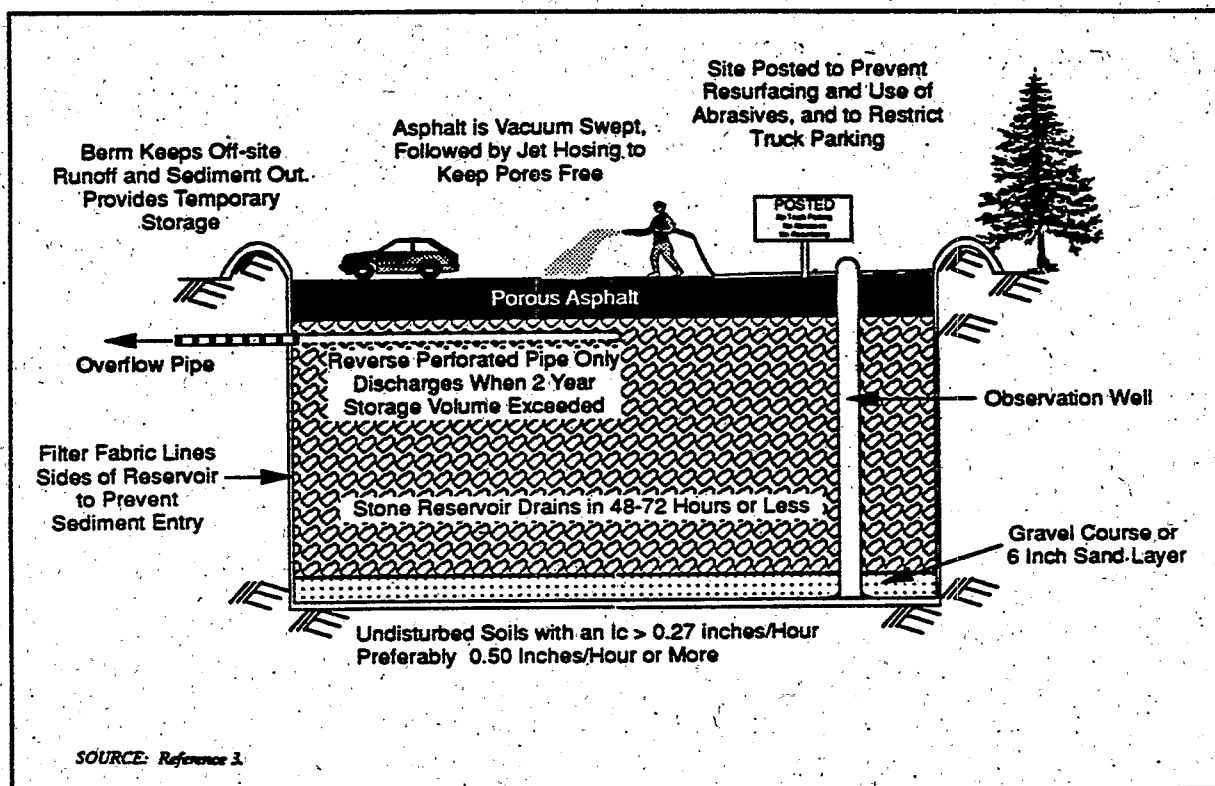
TYPICAL POROUS PAVEMENT INSTALLATION
